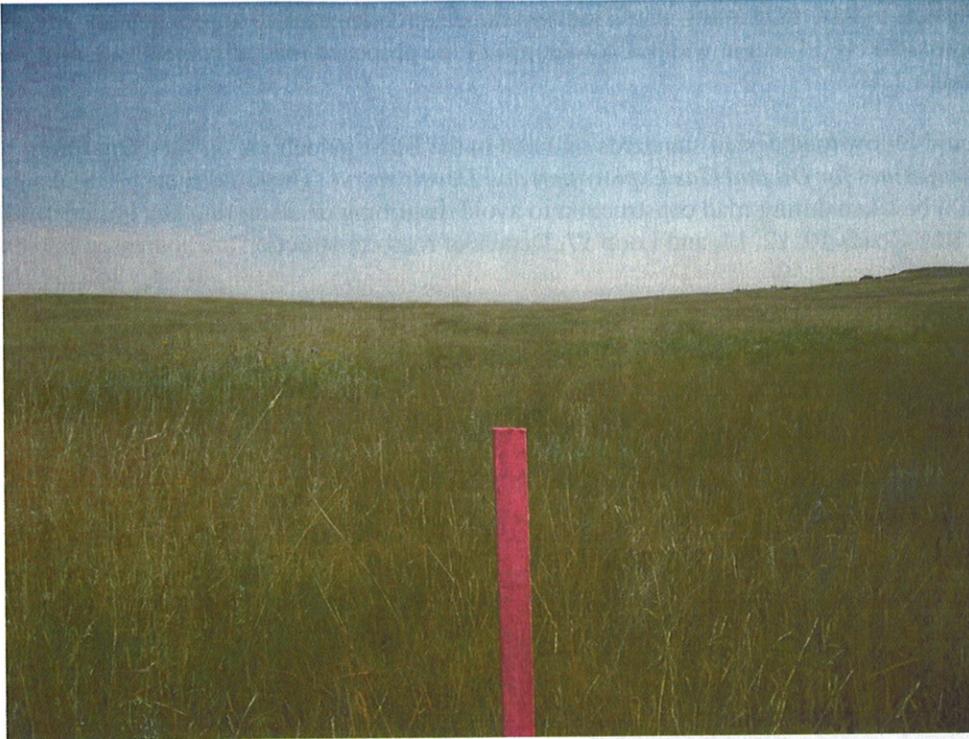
Proposed access road to the JM Hall 1-19H location looking north to the existing primitive road.
